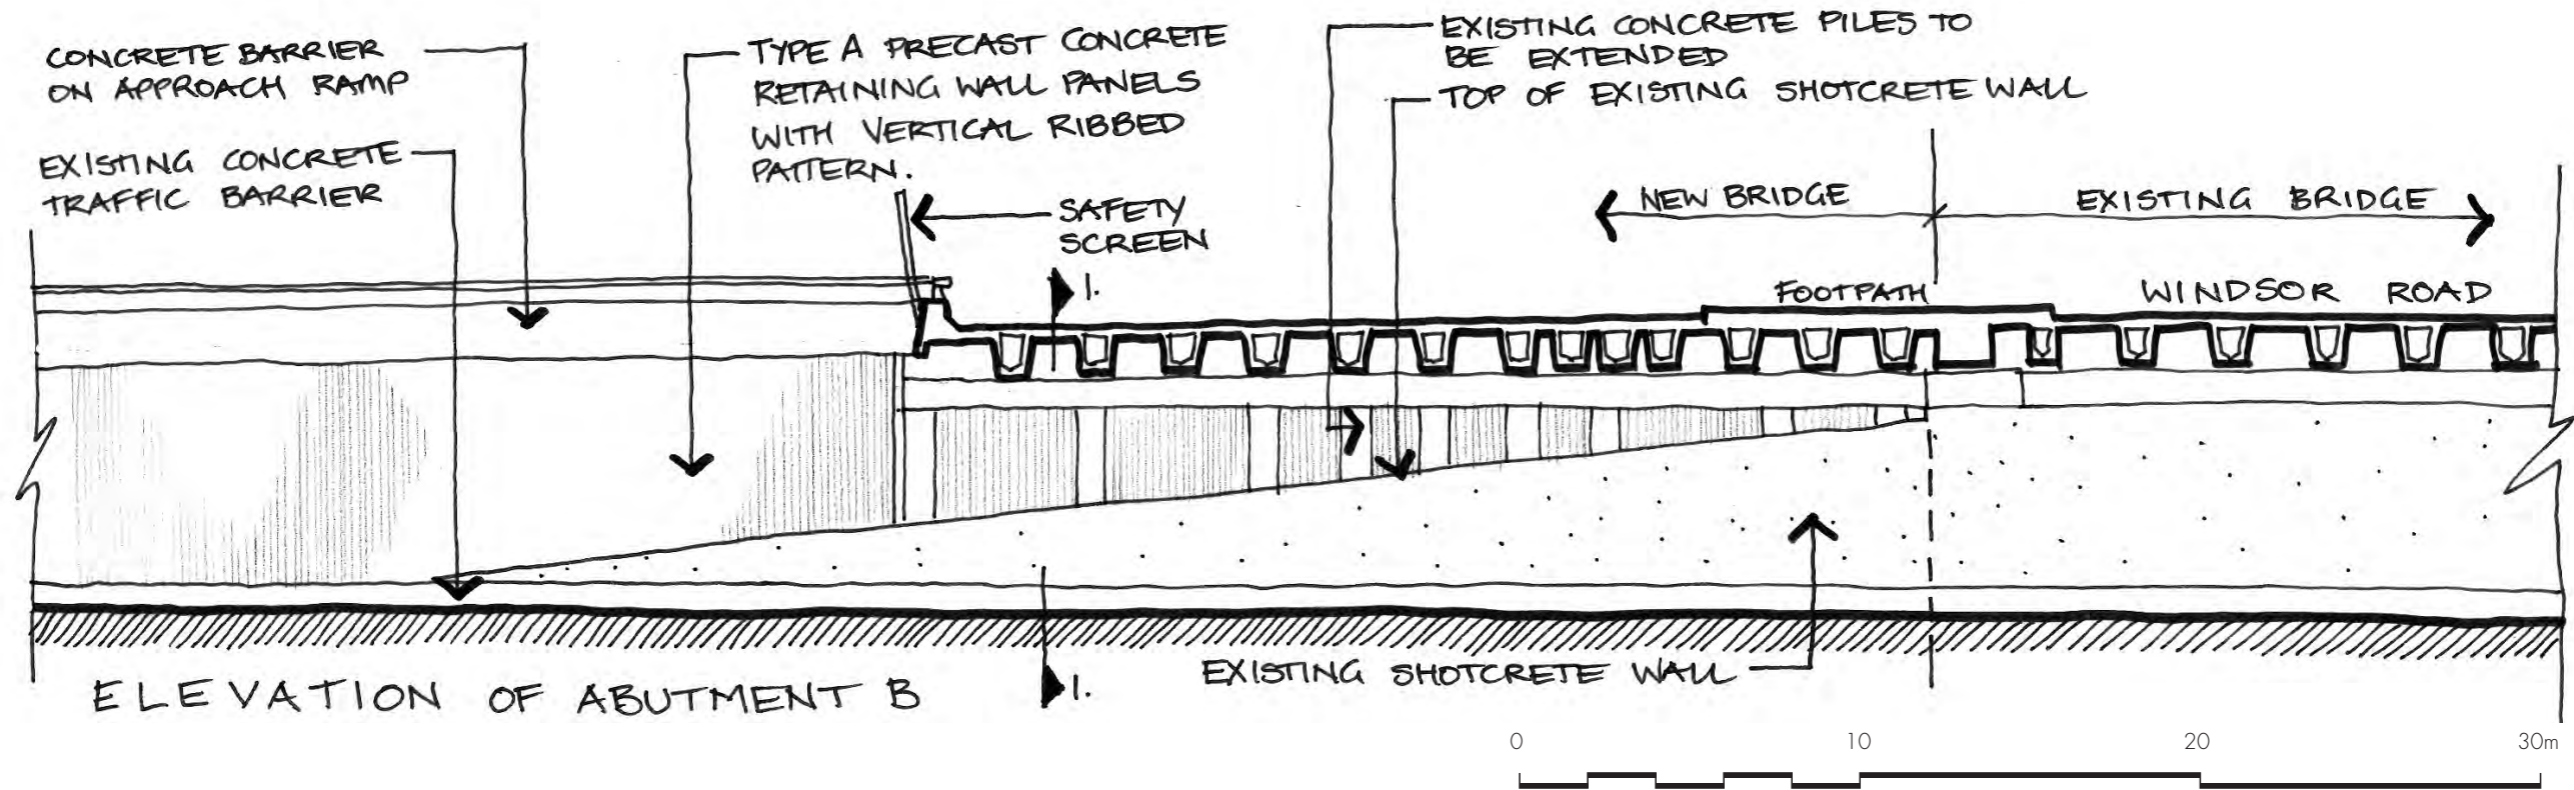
Type A Retaining Wall at Windsor Road Overbridge
